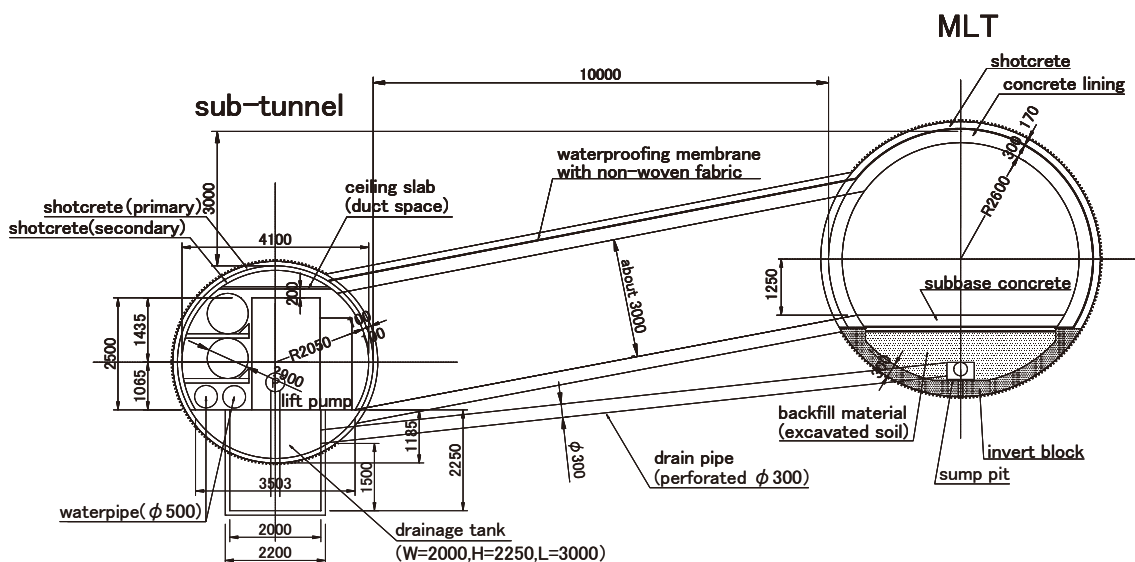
Standard plan for waterproofing and draining of the connecting passageways
